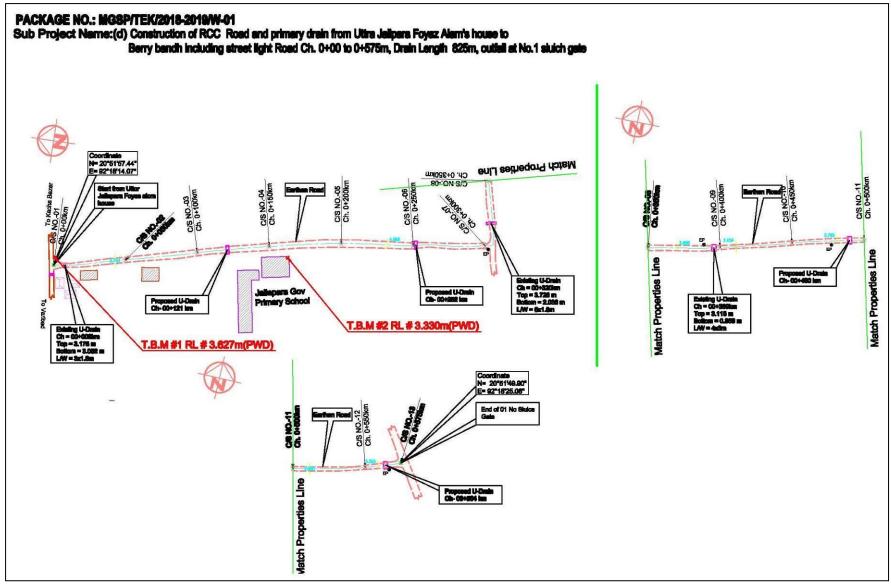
(d): Layout Plan for the proposed Subproject (d) Uttar Jaliapara Foyaz Alam's house to Berry bandh road
